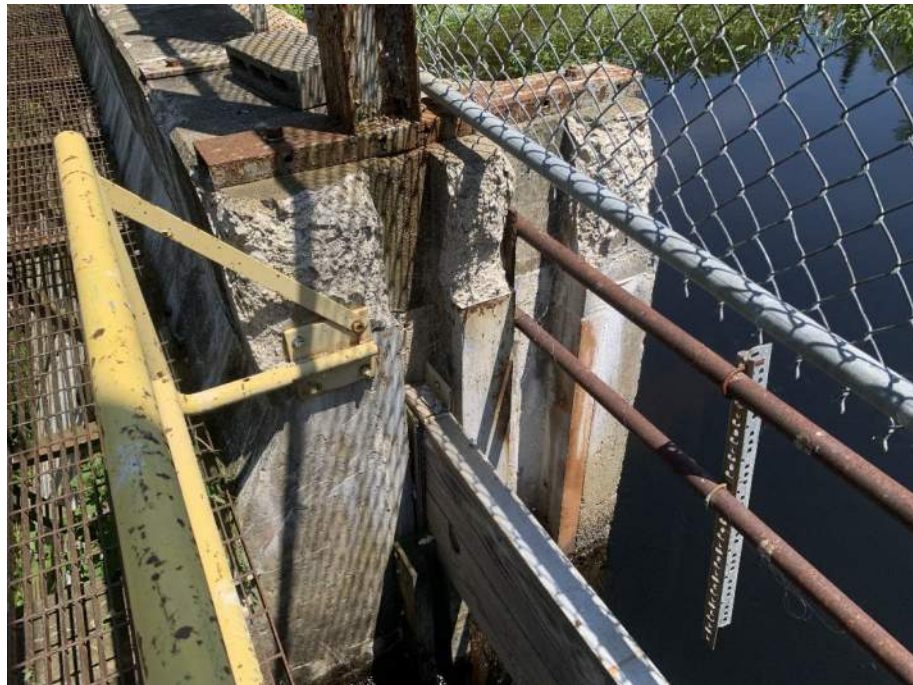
View of right side of fishway intake. Note concrete loss.
